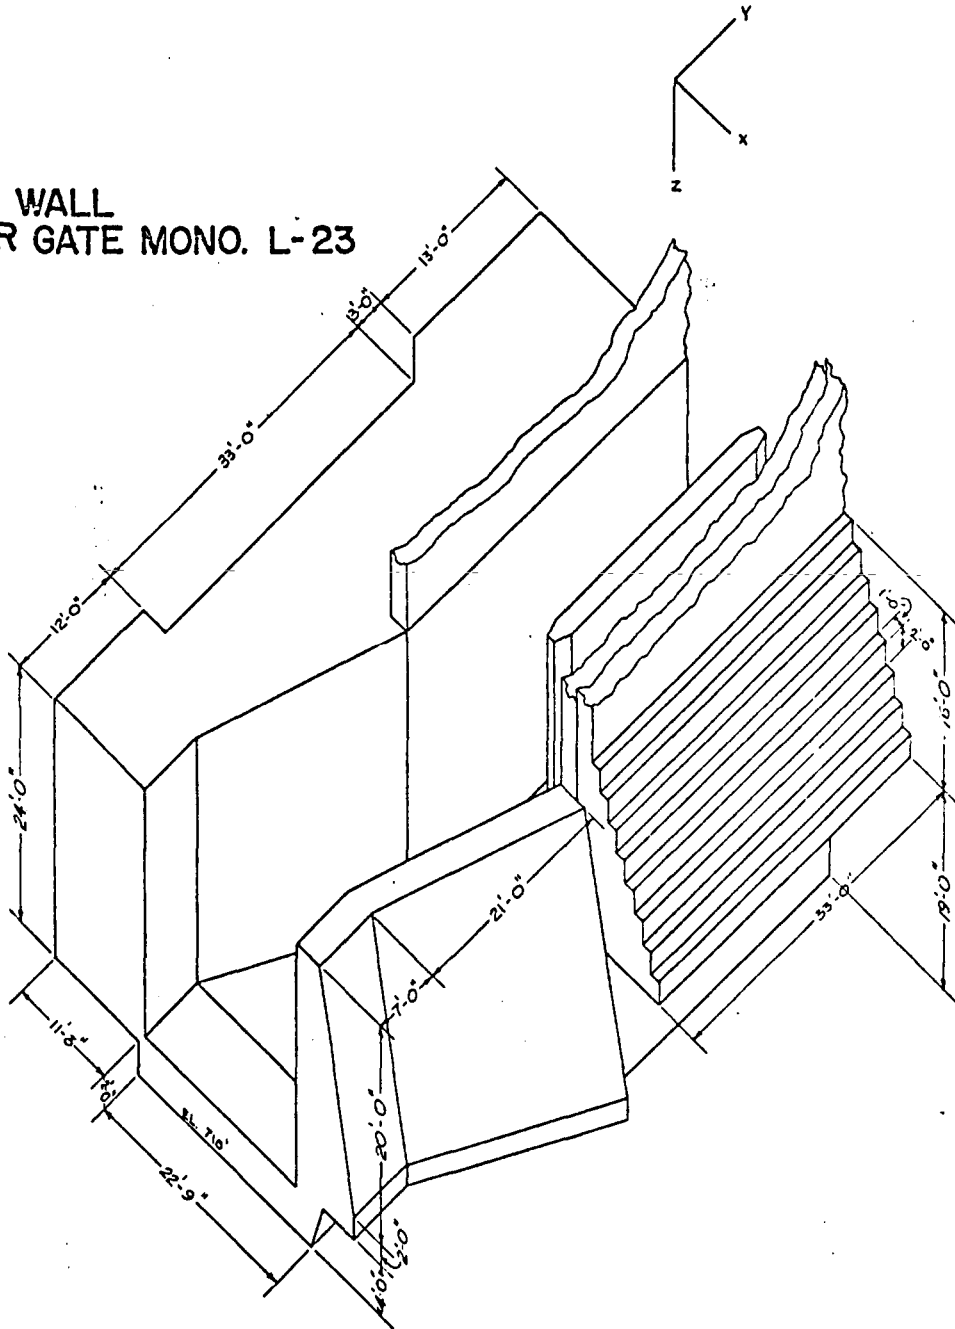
THREE DIMENSIONAL VIEW - LAND WALL
